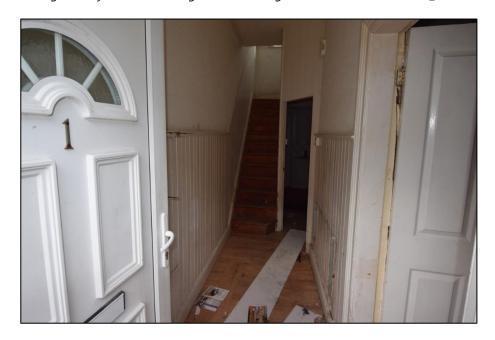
Wood panelling in the hallway of No. 1 Photo CPAT 5077_006
